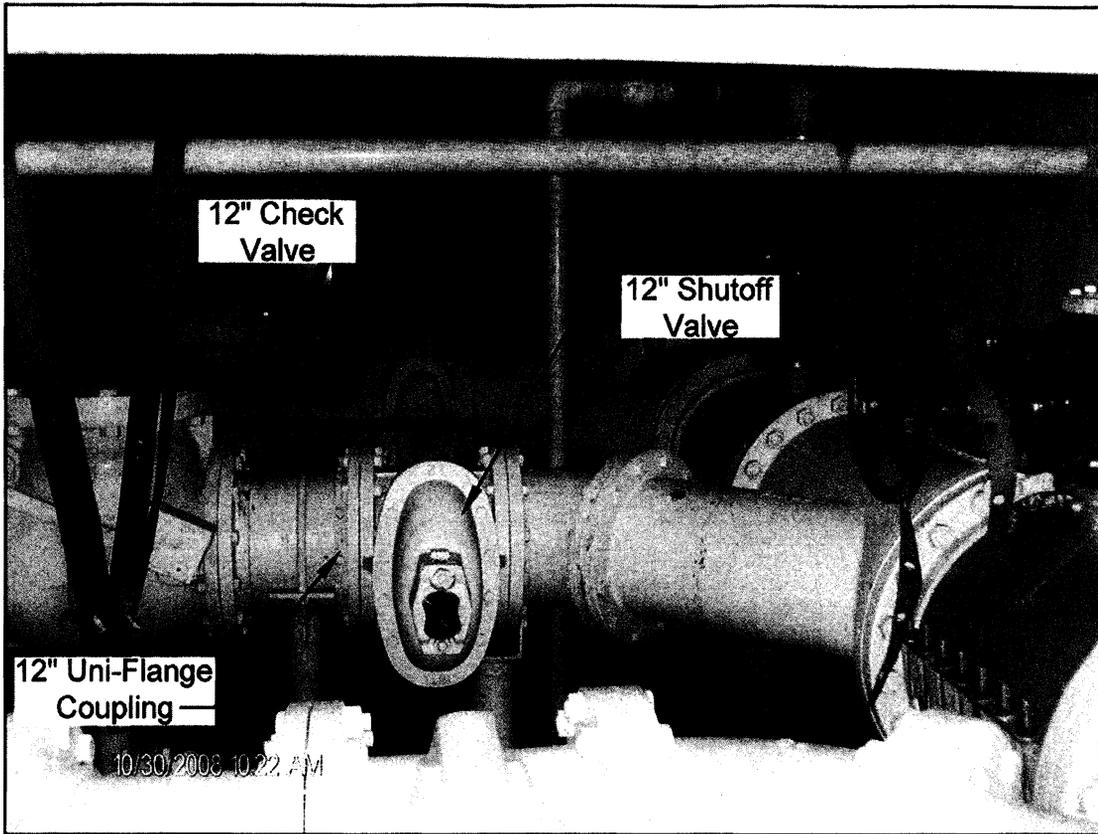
Pump #3 Uni-Flange Coupling on Discharge Piping
